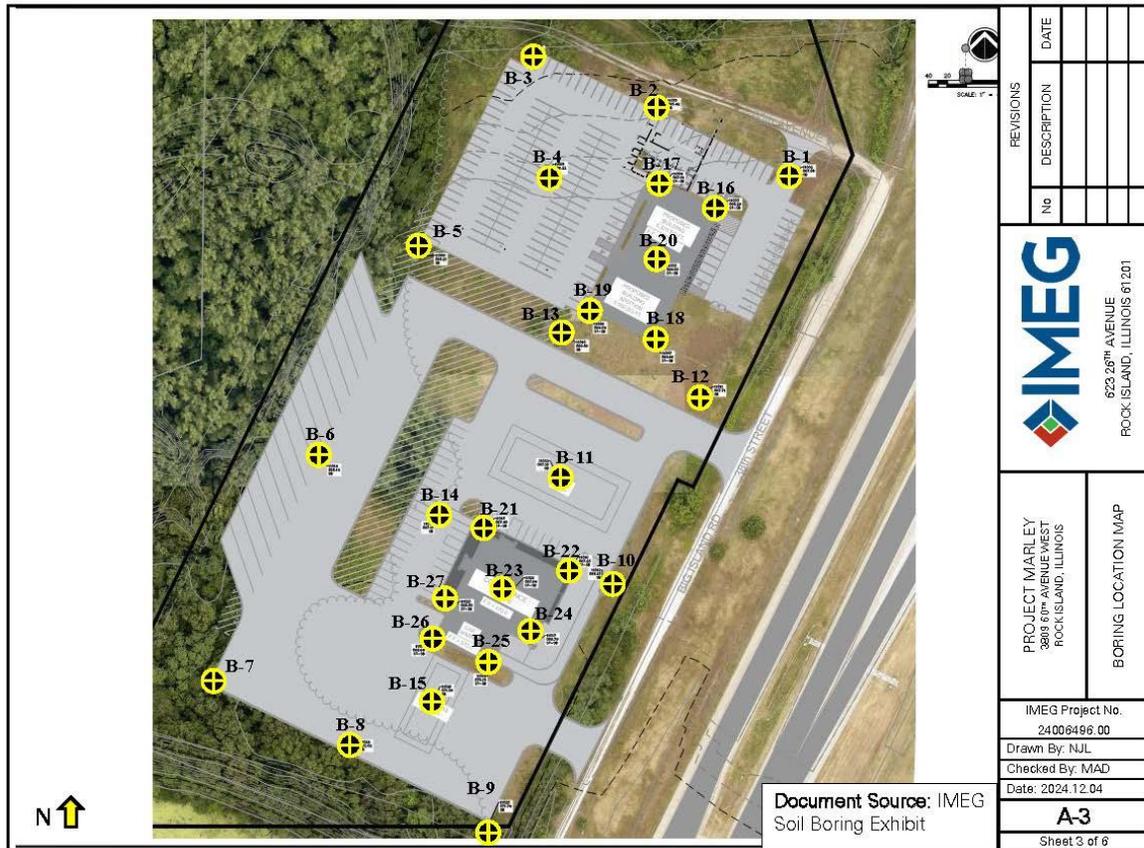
Engineering site plan and locations of soil borings conducted by IMEG in 2024. Source: IMEG (2024).
